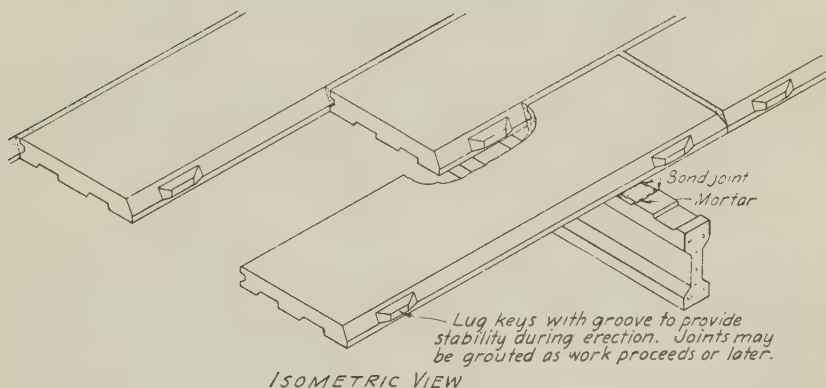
SUGGESTED SLAB DETAIL FOR KEYING SLABS TOGETHER DURING ERECTION
